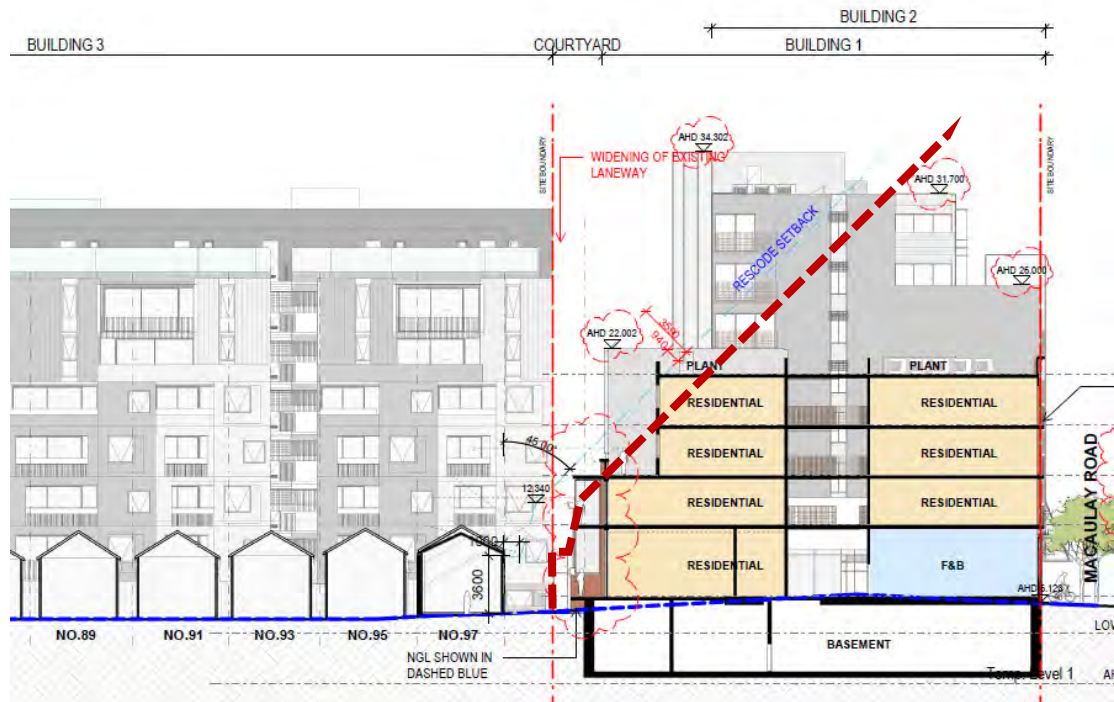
Marked up Section 5 depicting setback of Building 1 from the Council Laneway
